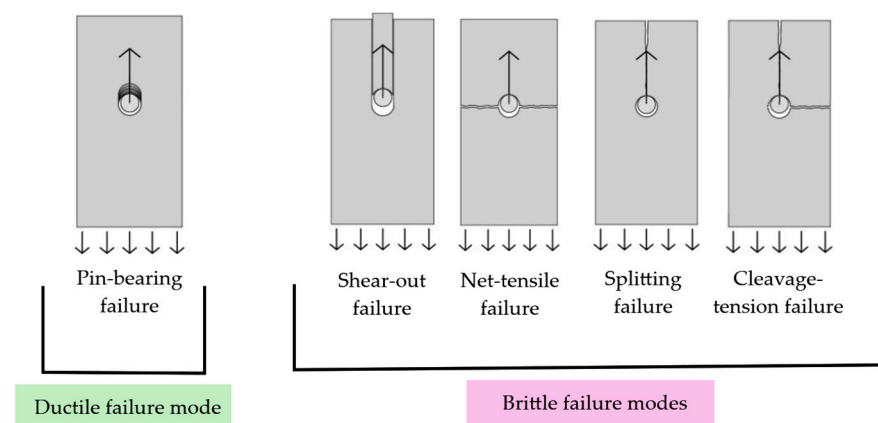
Schematization of typical failure modes of GFRP bolted connections subjected to longitudinal tensile load.
